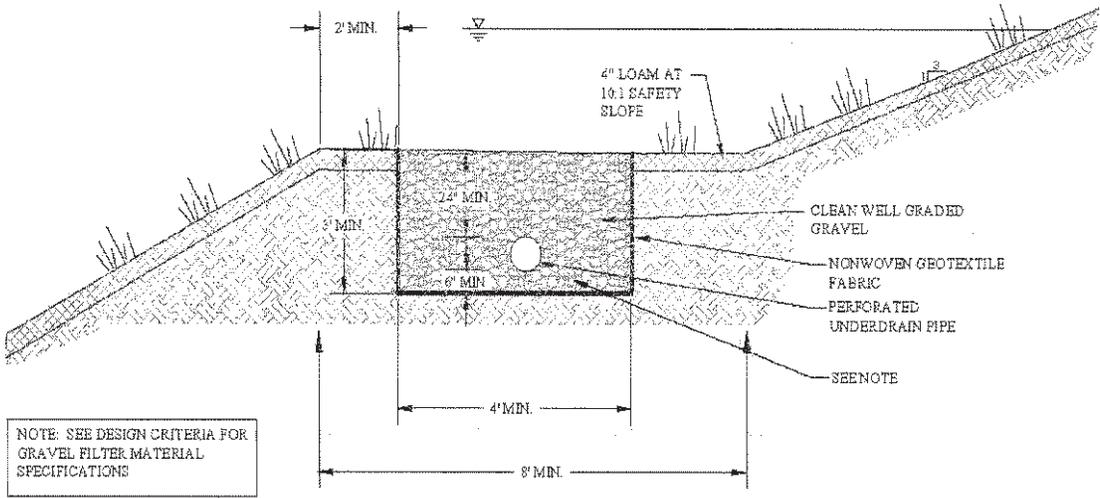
TYPICAL WET POND WITH UNDERDRAIN OUTLET
